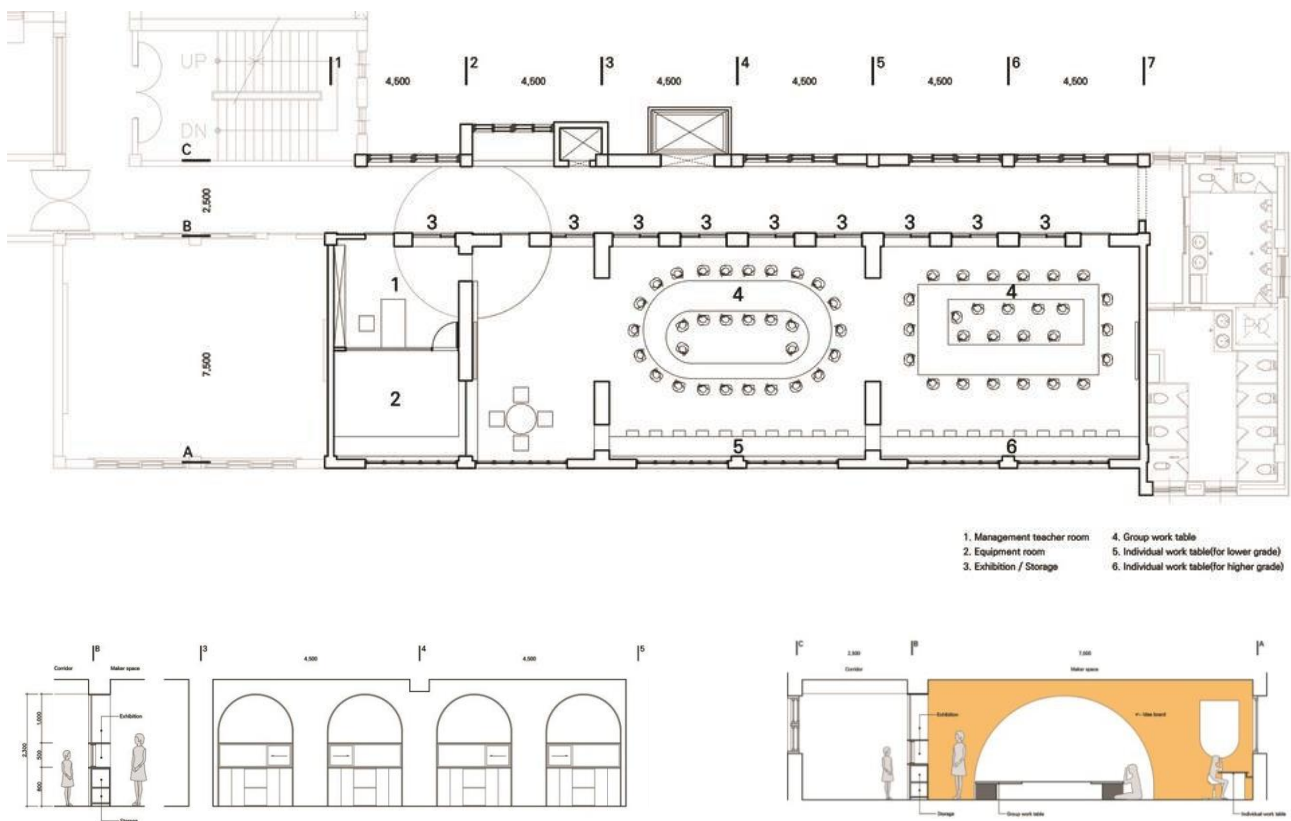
Plan & Sections of Maker-space Sungwon
